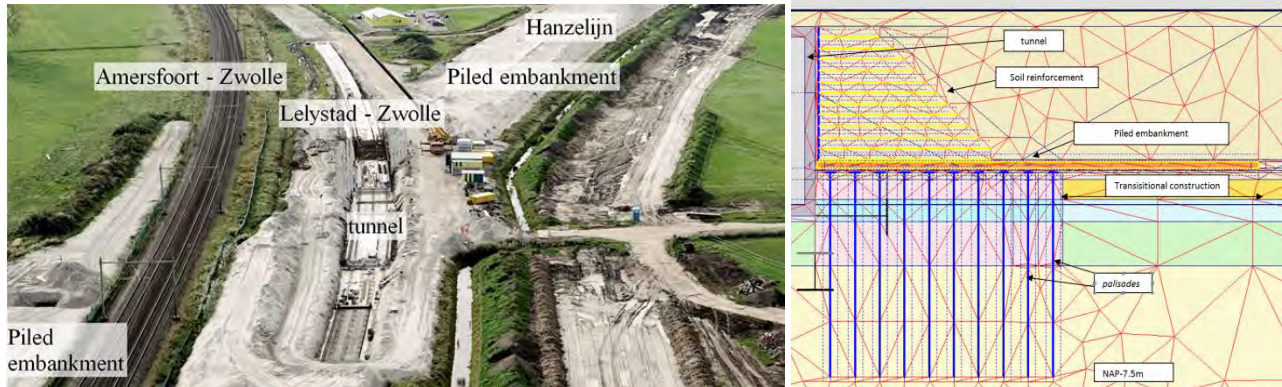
Overview Hanzelijn crossing tunnel (left) and Plaxis model LTP and soil reinforcement (right)
